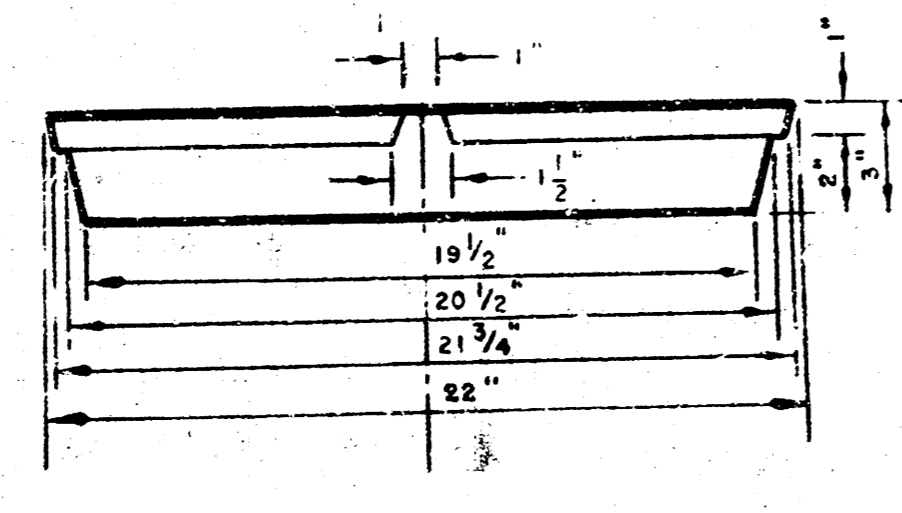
DETAIL OF DROP STACK FOR EXISTING MANHOLES IN GROUND WATER
